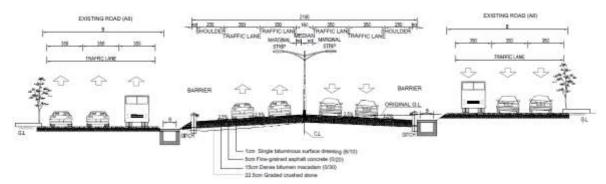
Standard Cross Section (21.6m) of Roadbed of General Section
